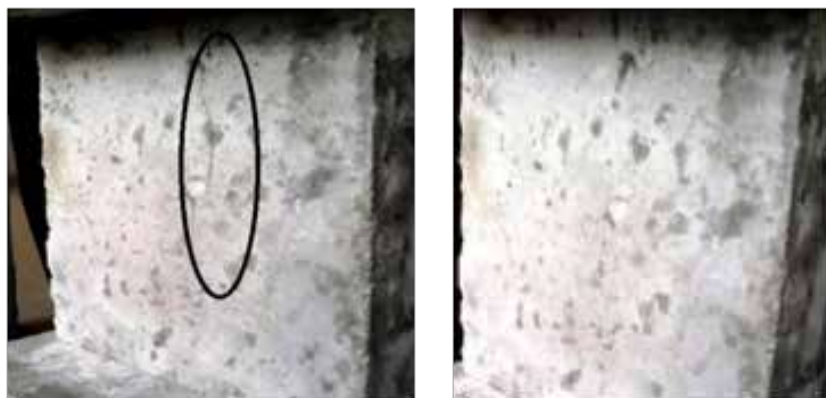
Crack healed concrete specimen With crack (left) & Healed Specimen (right)
